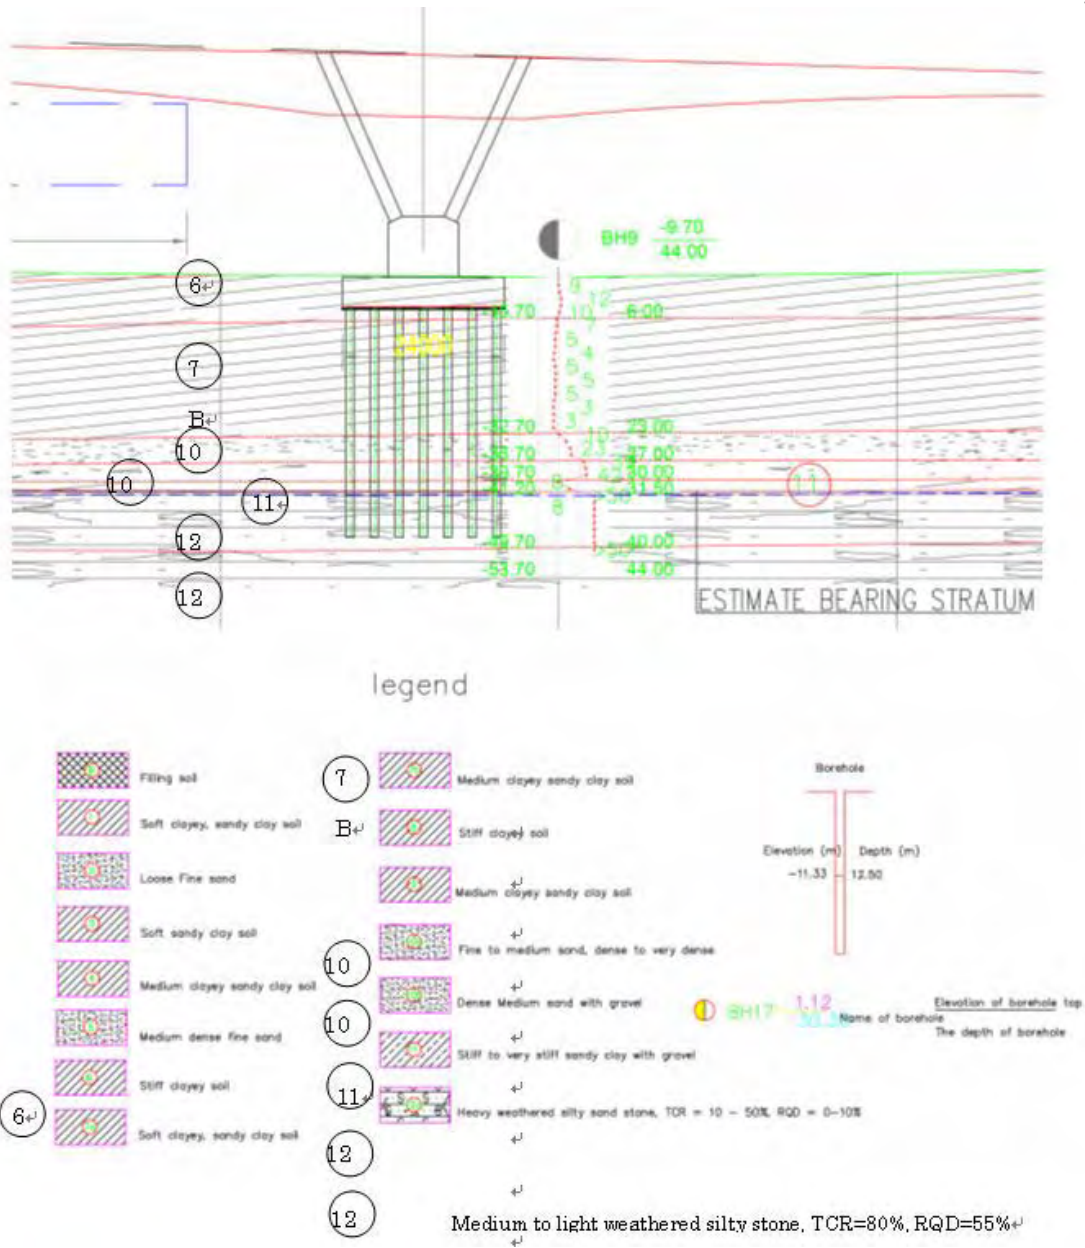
Typical Cross Section of Ring Road in Dinh Vu IZ
